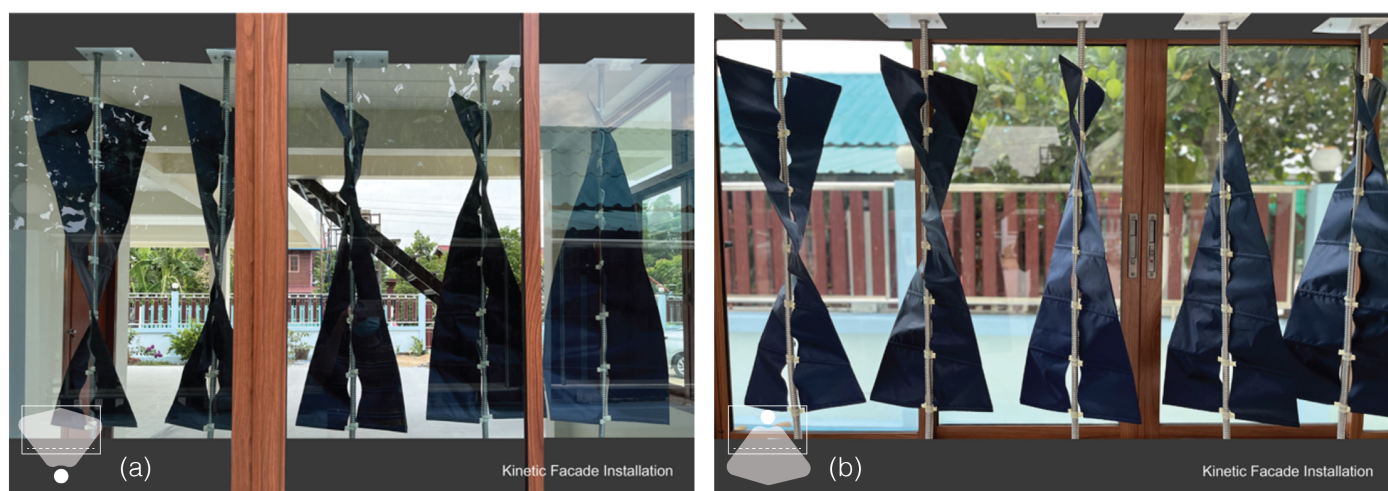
The kinetic façade (version 2: twisting movement) installation views from outside and inside. (a) The kinetic façade installation (view from outside); (b) The kinetic façade installation (view from inside).
